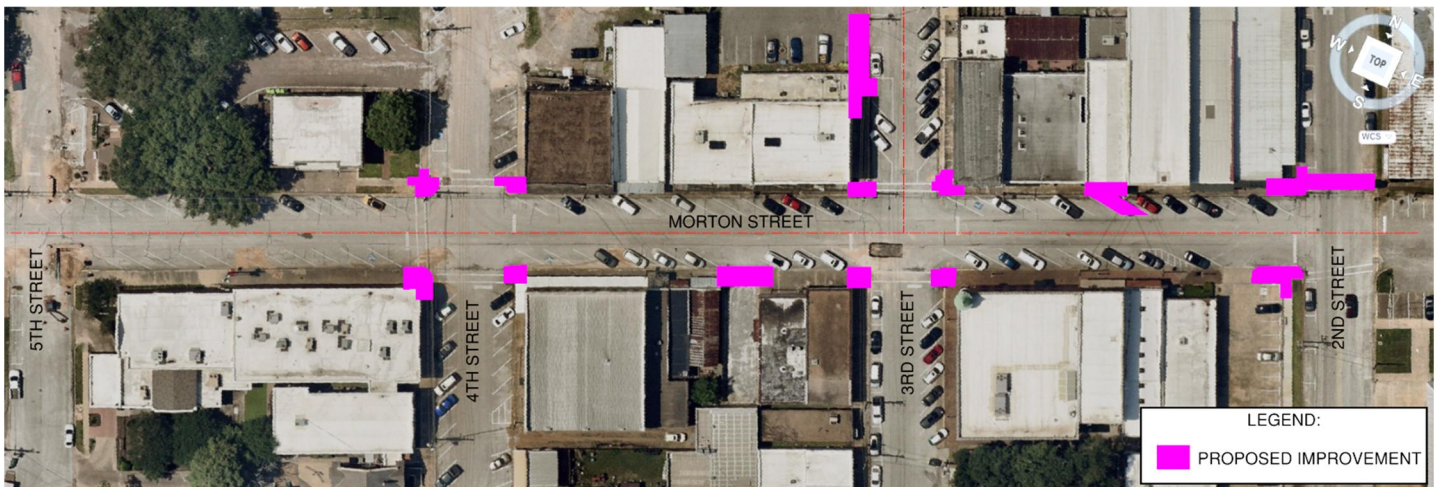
Proposed Paving and Hardscape Elements for Strategic Spot Improvements
